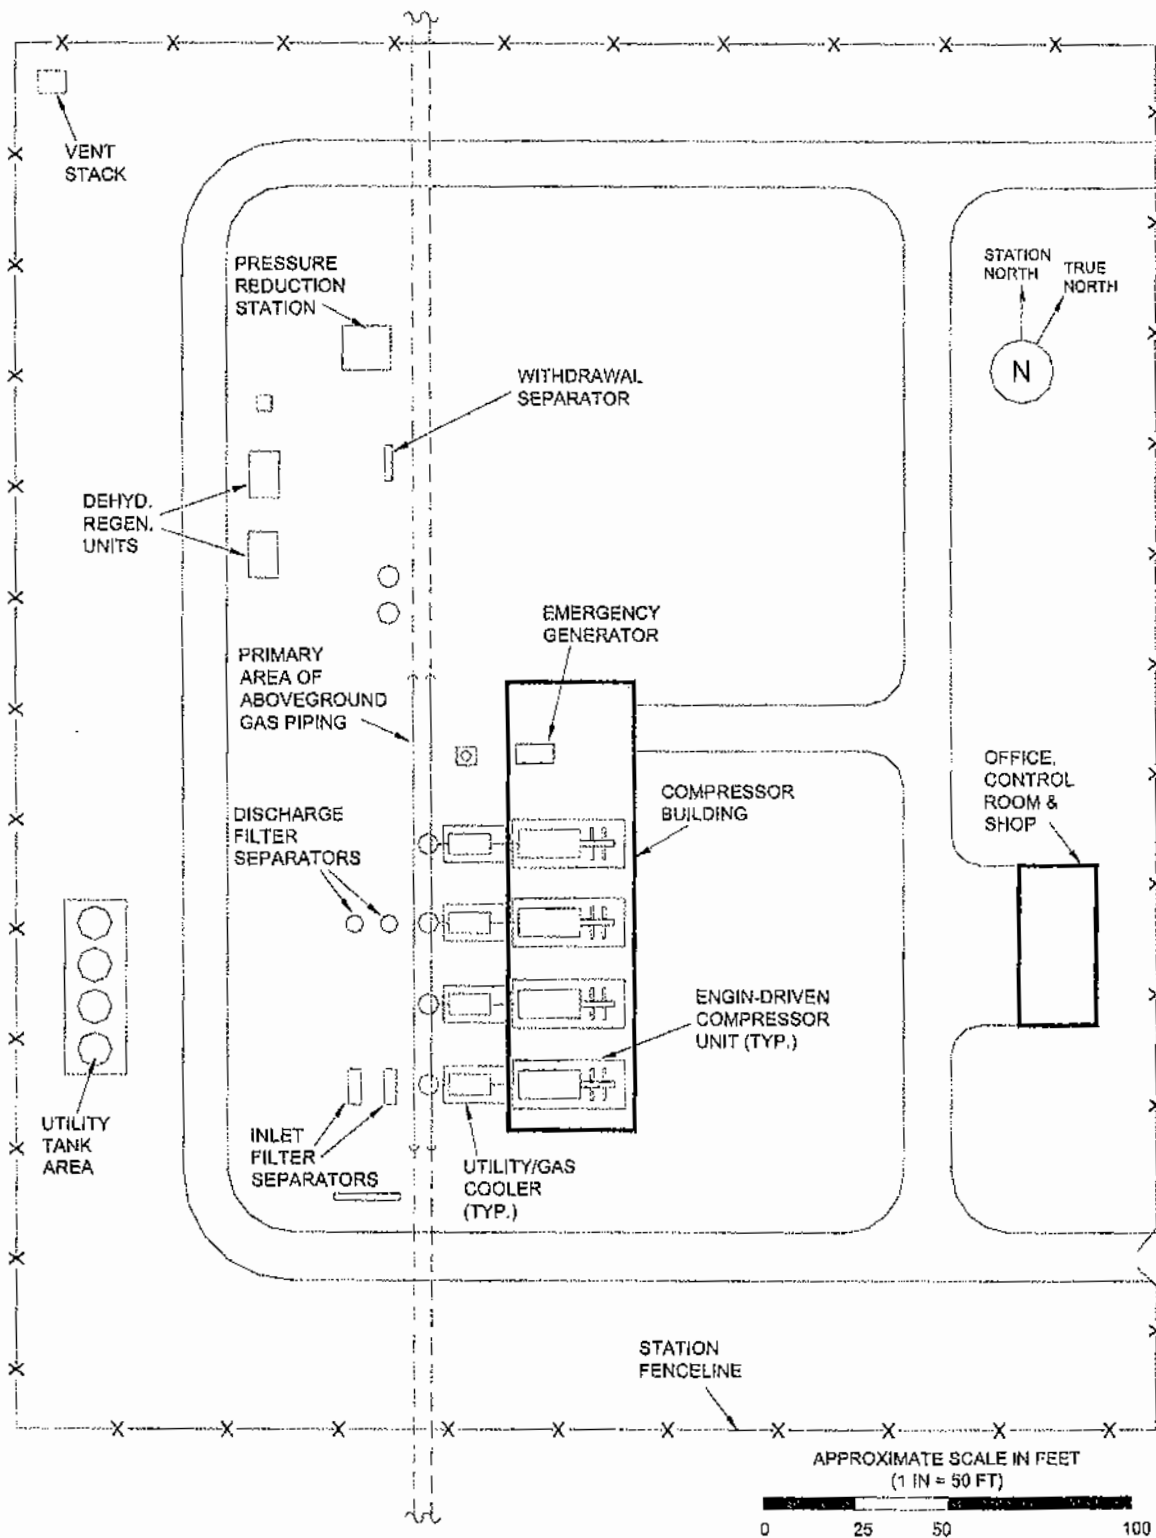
Kirby Hill Gas Storage Facility: Conceptual Layout of Buildings and Equipment associated the Compressor Station for the Facility.
